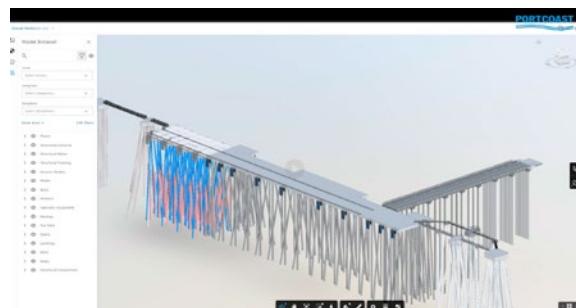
Autodesk Construction Cloud (ACC); Integrate existing structures and new design structures into one BIM model
